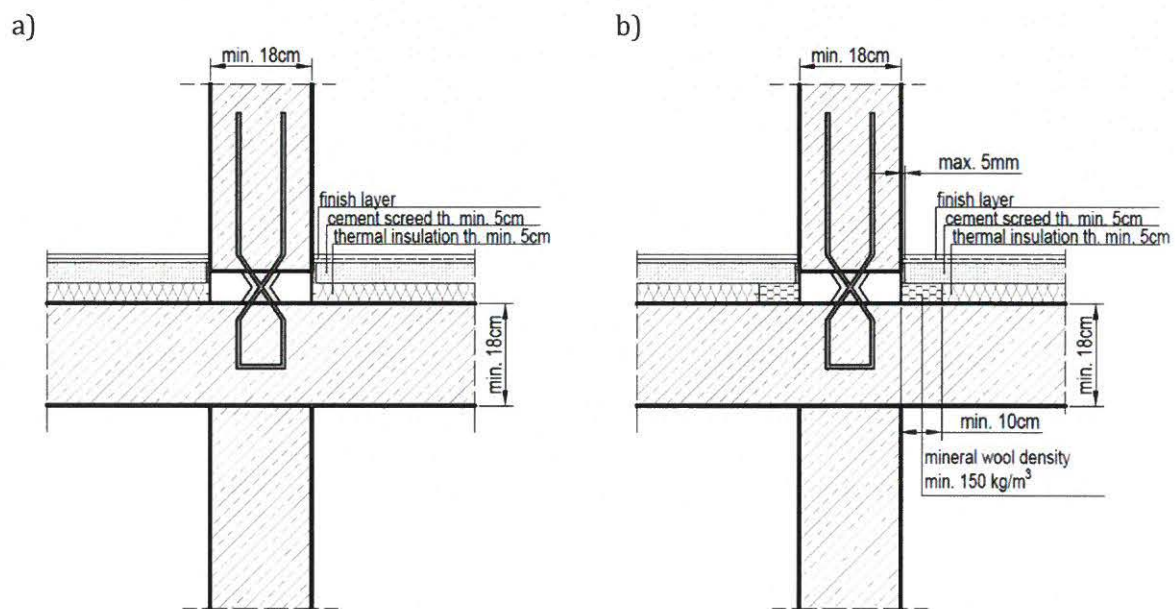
Internal wall and floor connection with Schöck Alphadock / Sconnex Typ W
